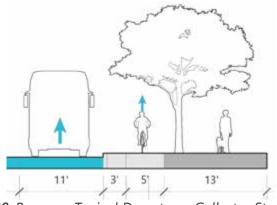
Bus on a Typical Downtown Collector Street with a One-Way, Sidewalk-Level Class IV Bikeway.
